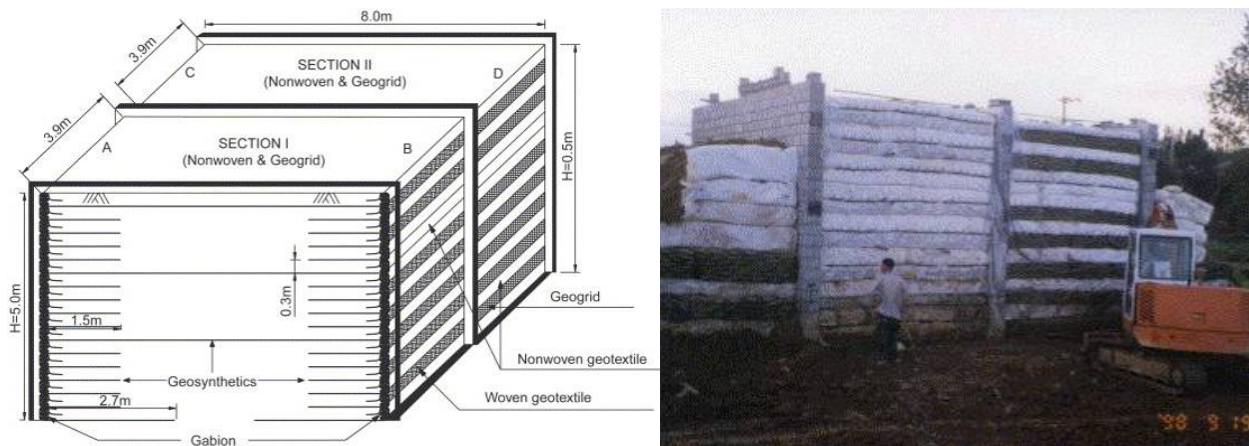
Schematic Diagram of a GRS Wall and GRS System after Construction
